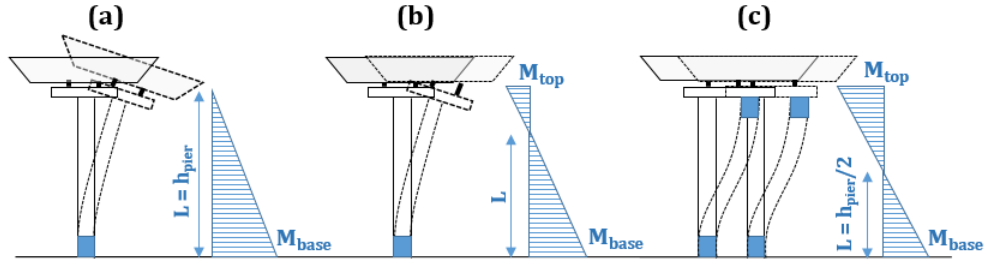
Typical flexural length L for (a) Cantilever pier with torsionally free deck; (b) Cantilever pier with torsionally constrained deck; (c) Double bending piers (adapted from Cardone [2014]).
